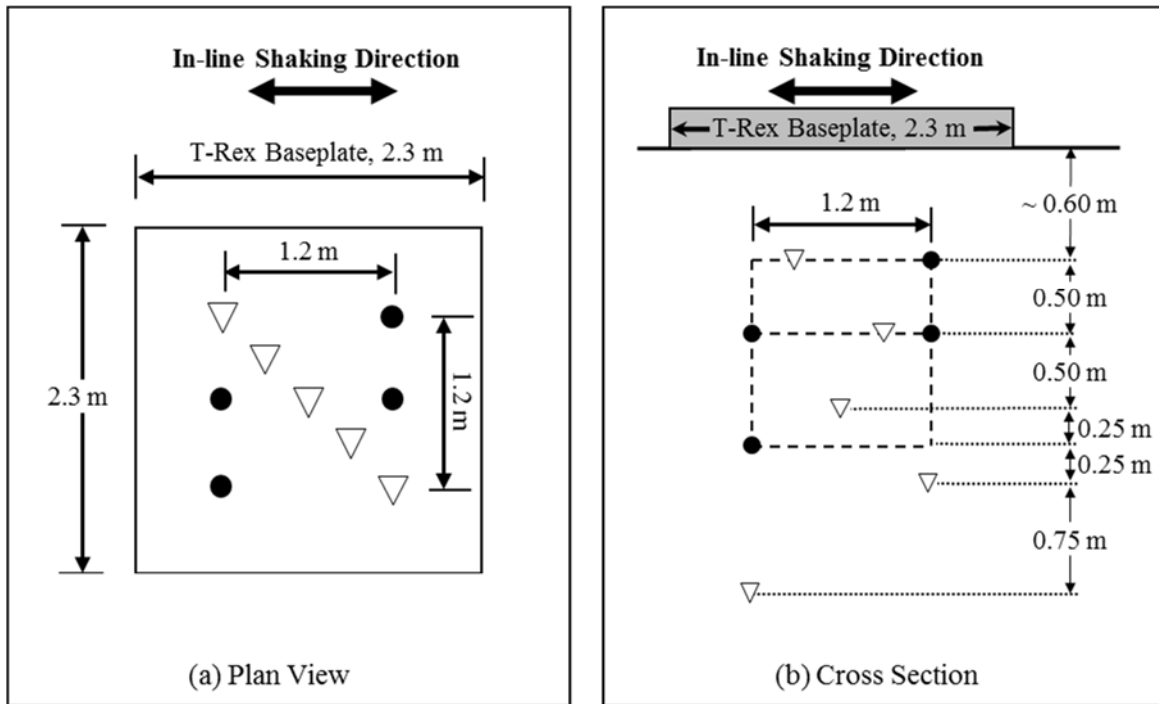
Plan and cross-sectional views ((a) and (b), respectively) of the instrumentation array used at Site 4 for shake testing with T-Rex at test panels 4-NS-1 and 4-RAP-1.
